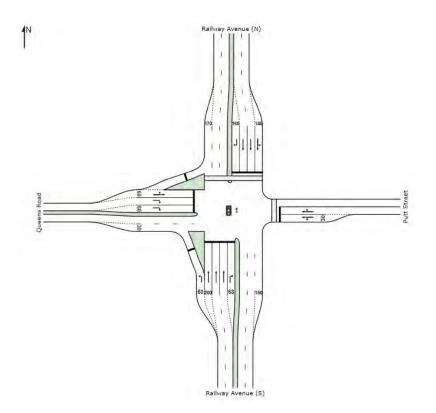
Proposed improvements at Railway Avenue, Queens Road and Putt Street for year 2033 with development traffic
